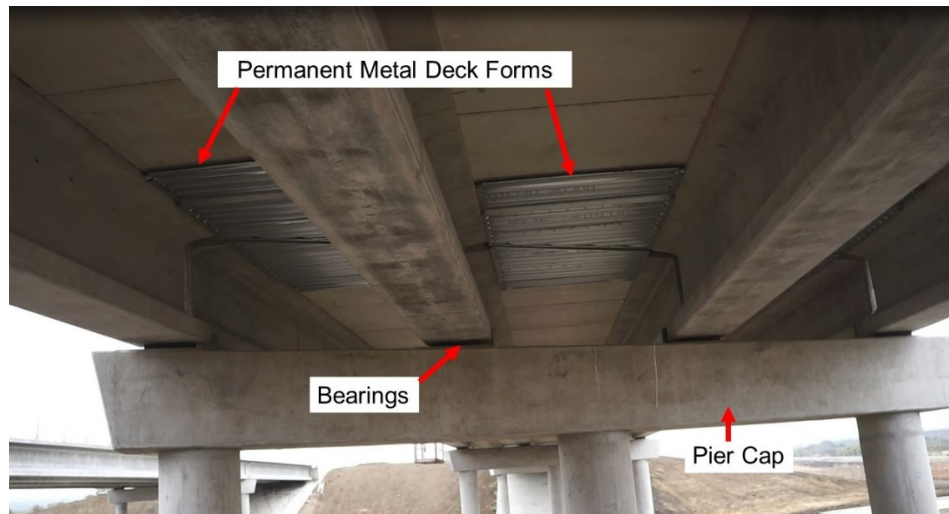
Under-bridge Inspection Featuring Bridge Substructure Elements
